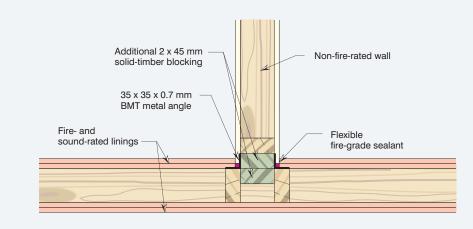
Non-fire-rated single stud wall abutting fire- and sound-rated single stud wall using timber blocks – FRL 90 minutes – plan view
